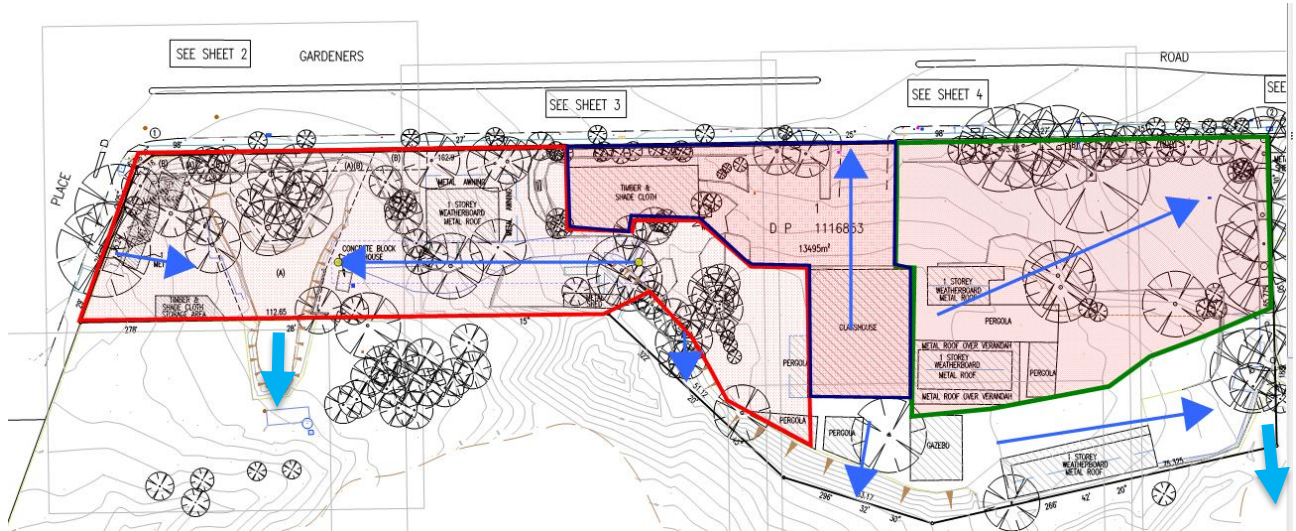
Approximate site sub catchments plan (75 Gardeners Road)
